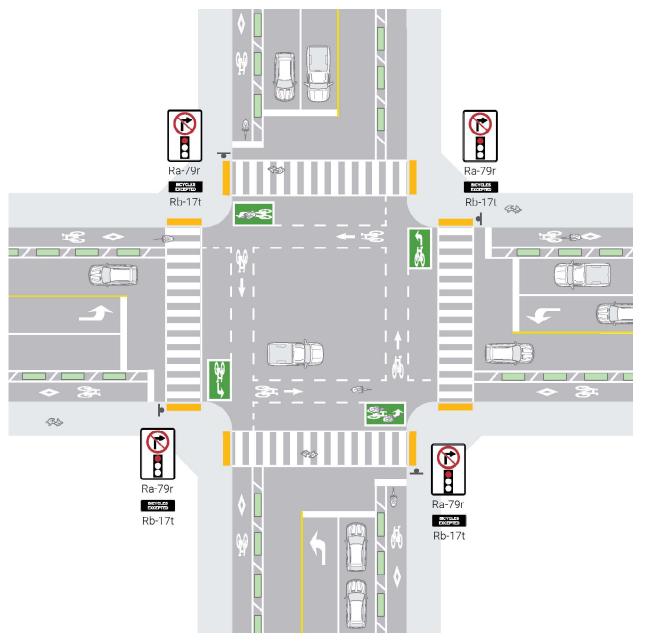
On-Street Two-Stage Queue Box, Typical Intersection
